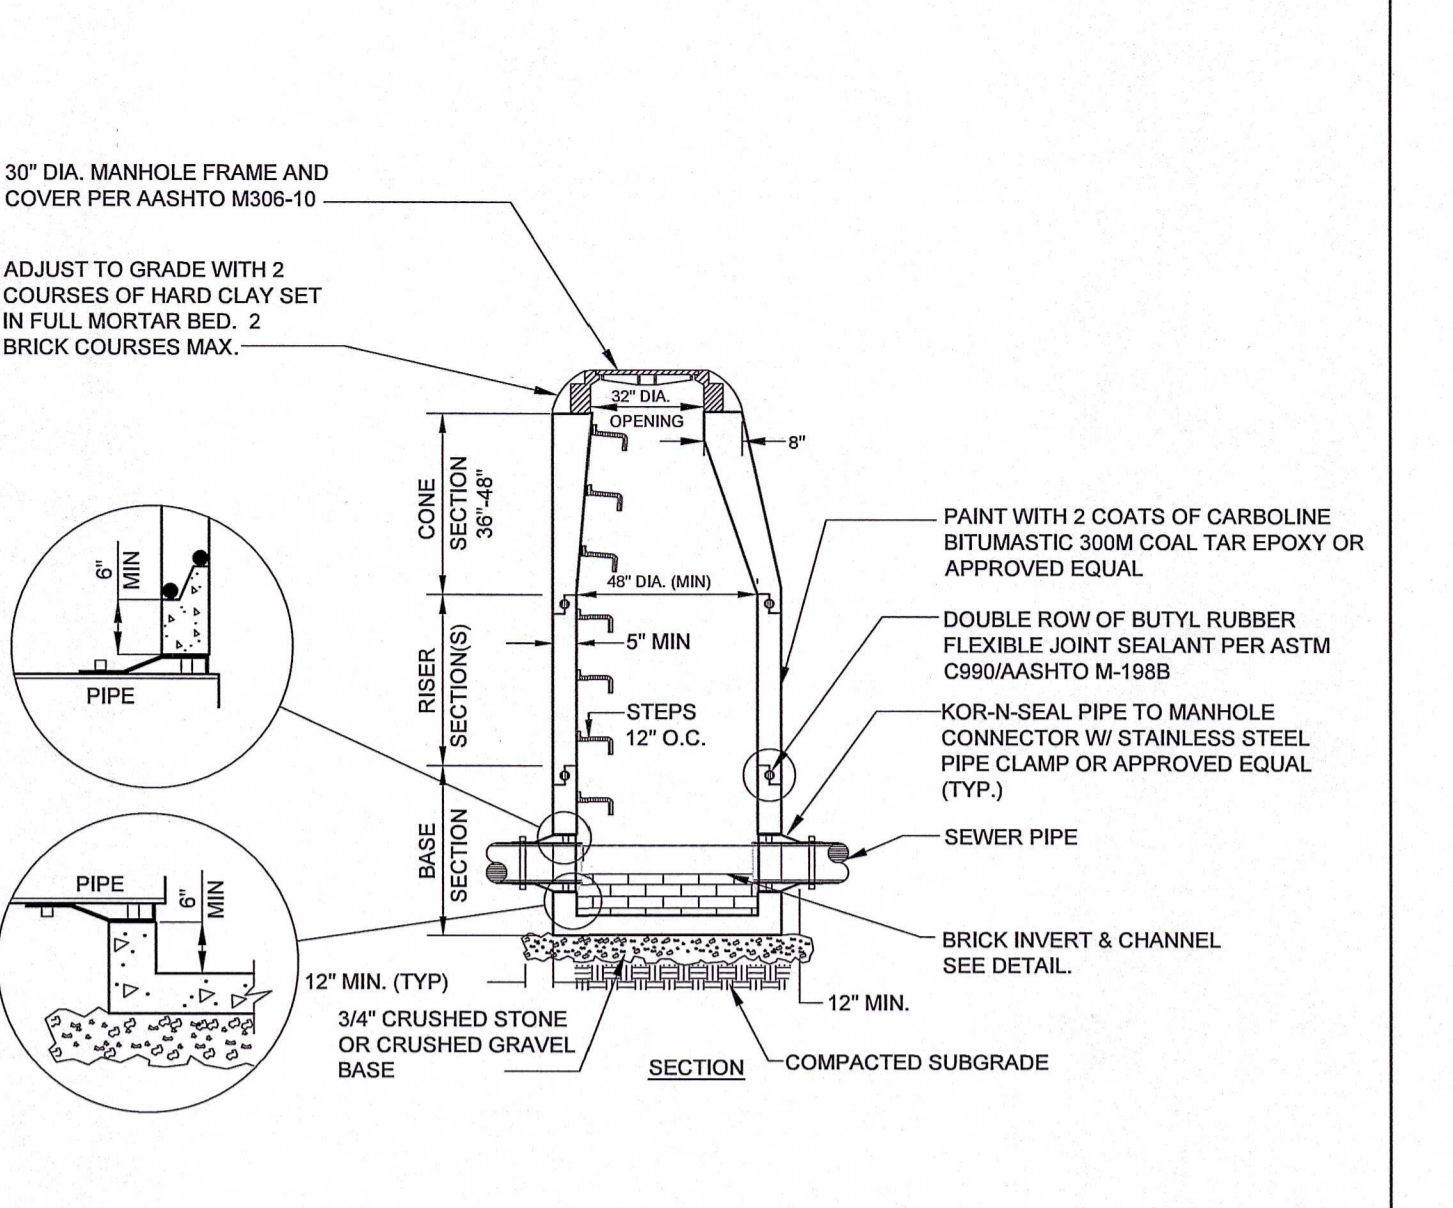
DETAIL 'A' SEWER MANHOLE JOINTING METHODS
